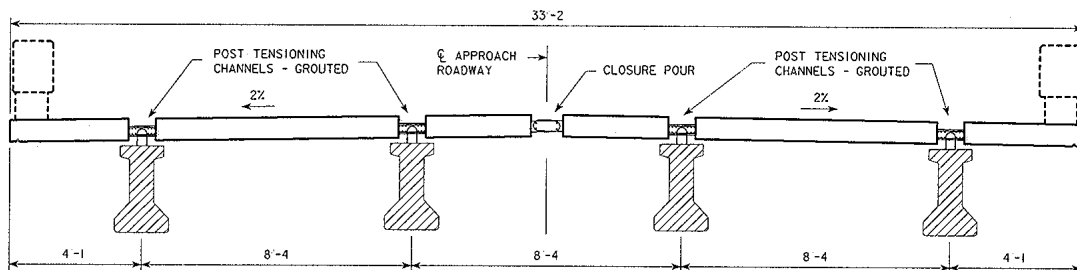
Boone County Bridge cross-section including the longitudinal joints
